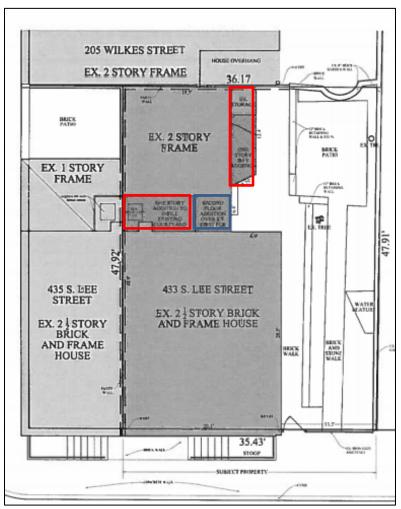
Proposed additions (red = one-story addition, blue = second story addition)
